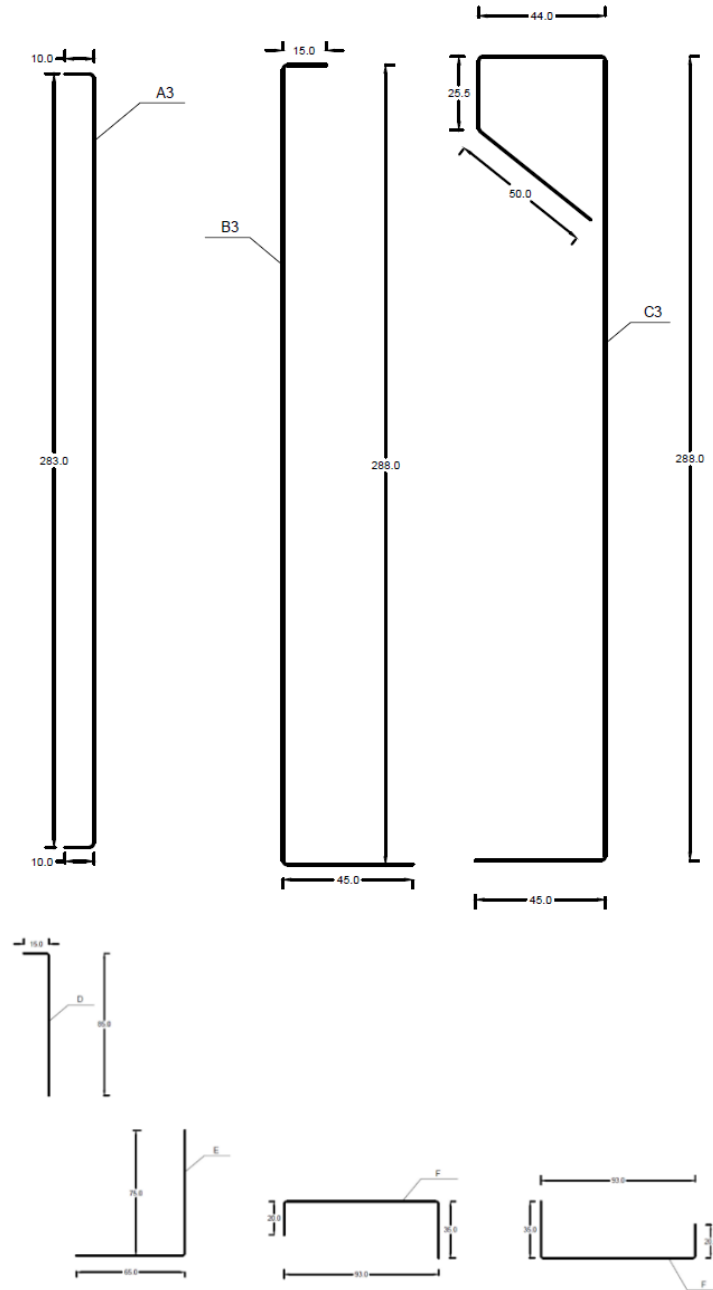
Steel layout in all (2.5m) columns before strengthening
